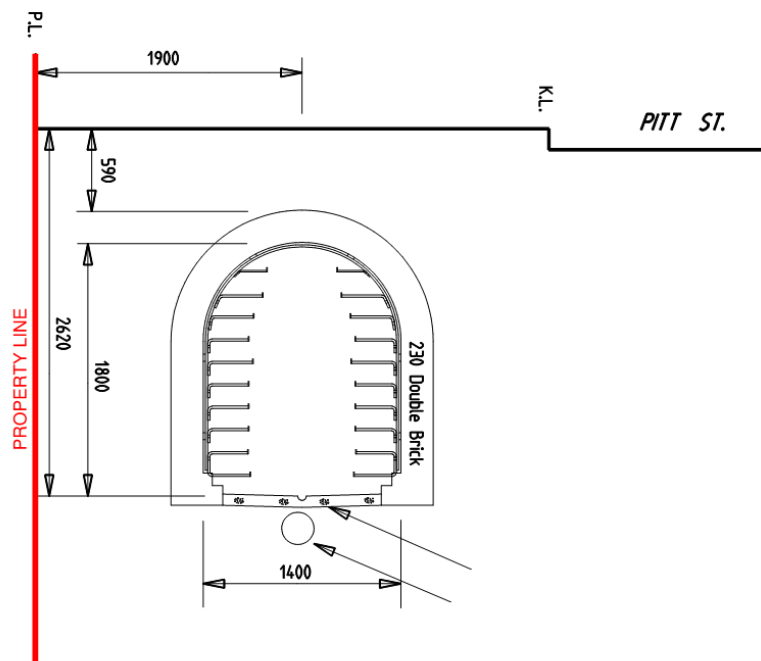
Telstra Tunnel Section (Looking South on Pitt Street)
